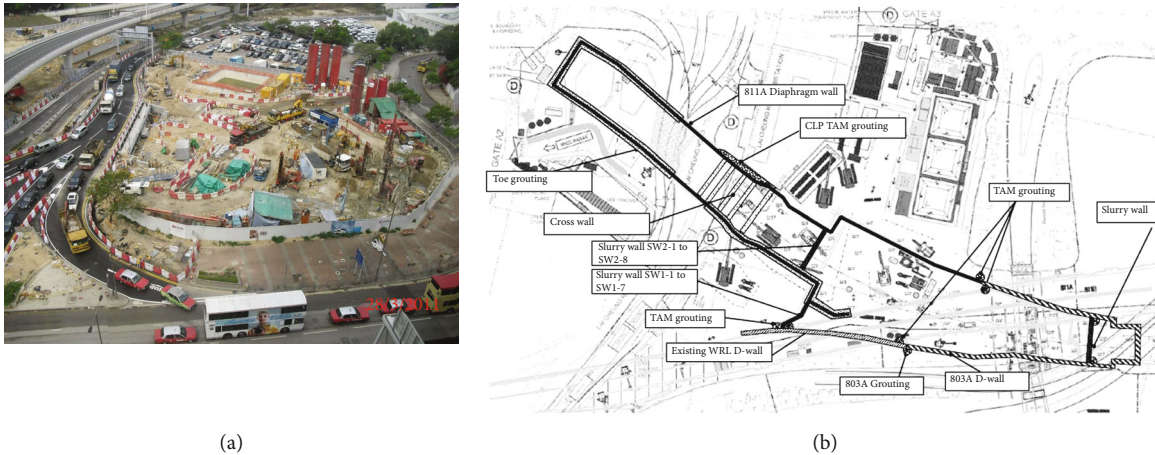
XRL site at Hoi Ting Rd. and WRL Tunnel, with 300 m long cofferdam made of diaphragm wall: (a) site photo before construction; (b) locations of diaphragm wall, slurry wall, and toe grouting prior pumping test.
